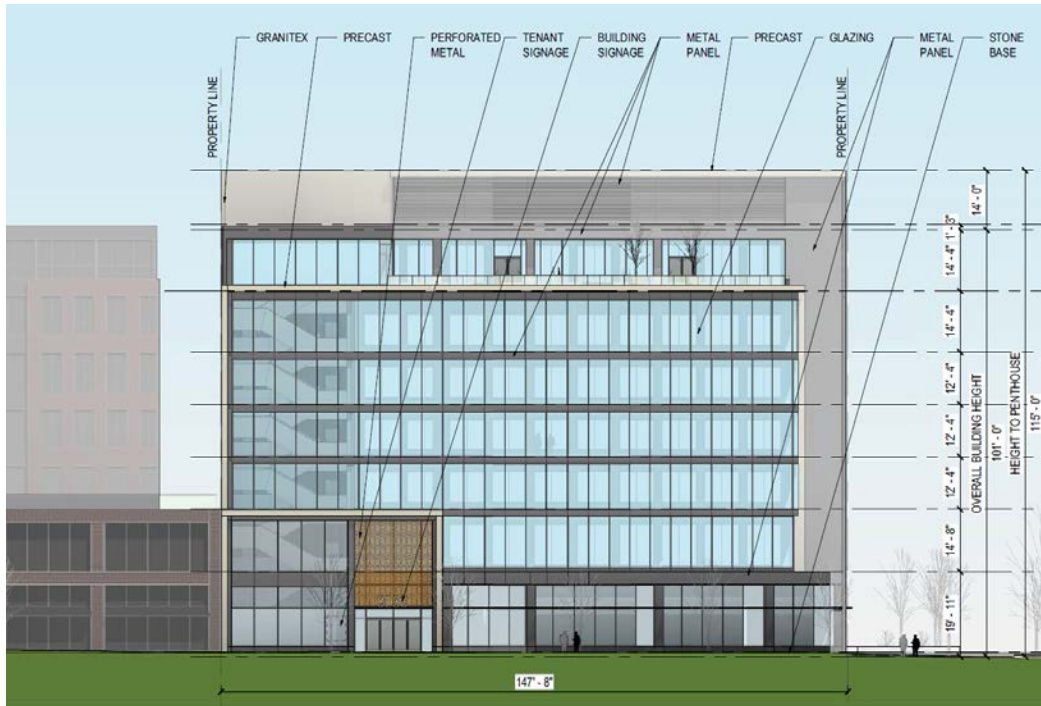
Eastern elevation of the APTA building where the entrance portal meets the NIB building.
